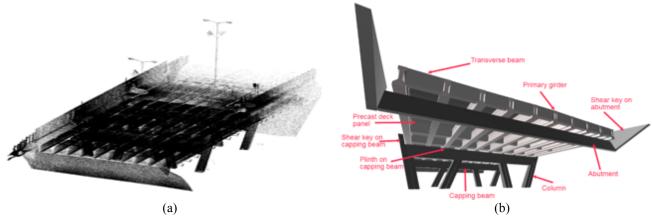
a) point cloud and b) 3D model of the concrete girder bridge Table 12
